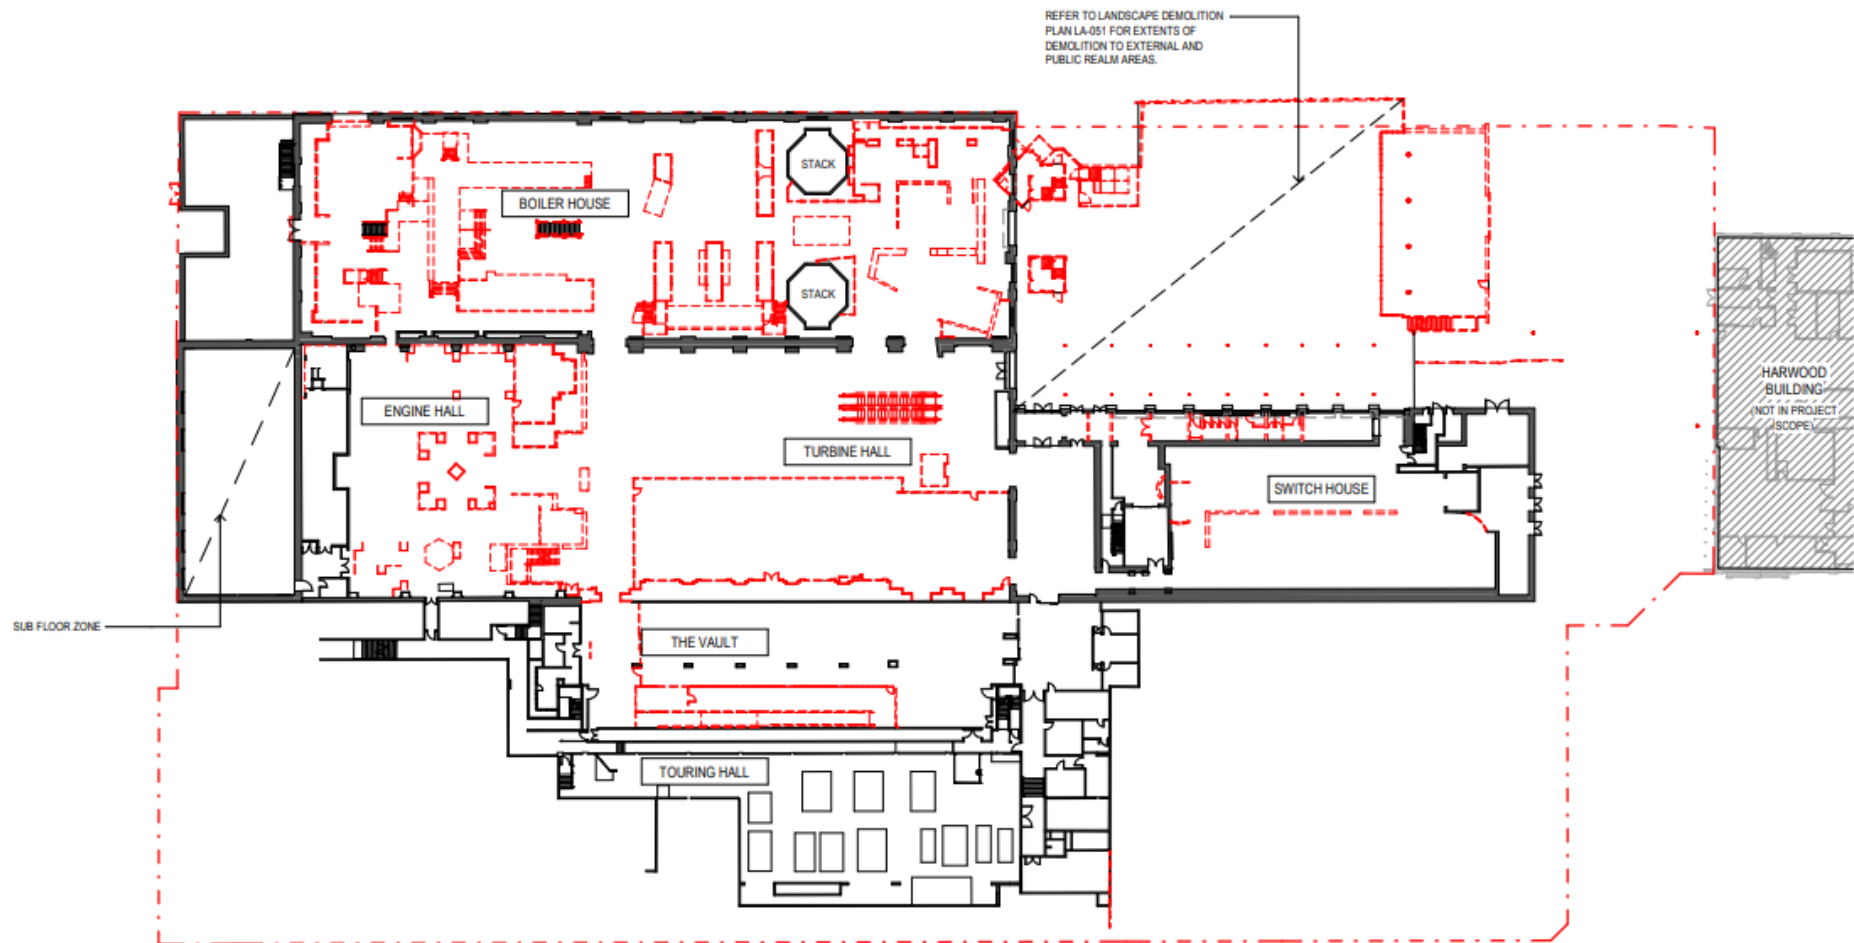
Ultimo Powerhouse- Reference Design Demolition Level L01 Plan (Source: John Wardle Architects, 17 May 2022)
